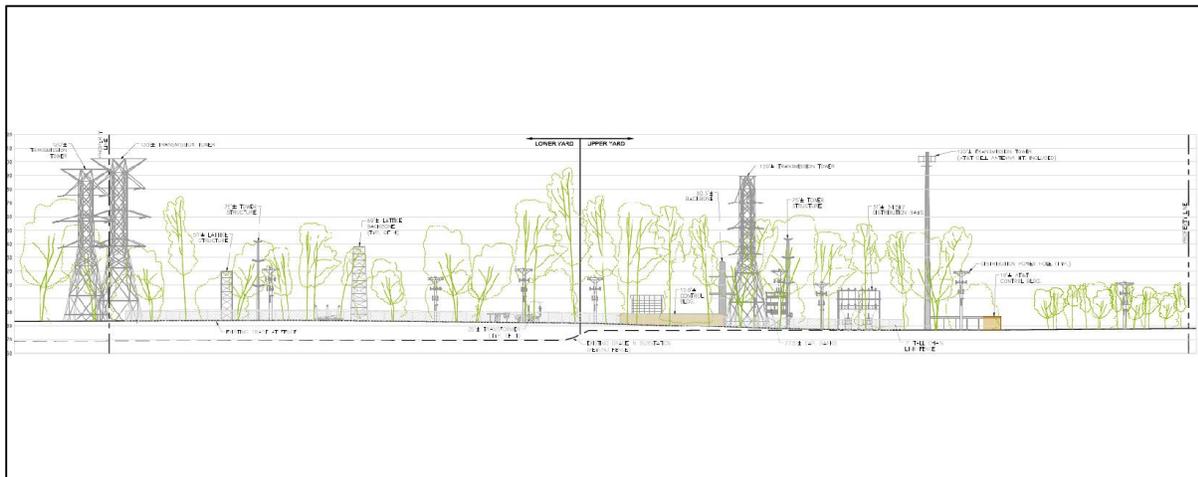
Elevation for Existing Features (Shreve Road is to the right)
